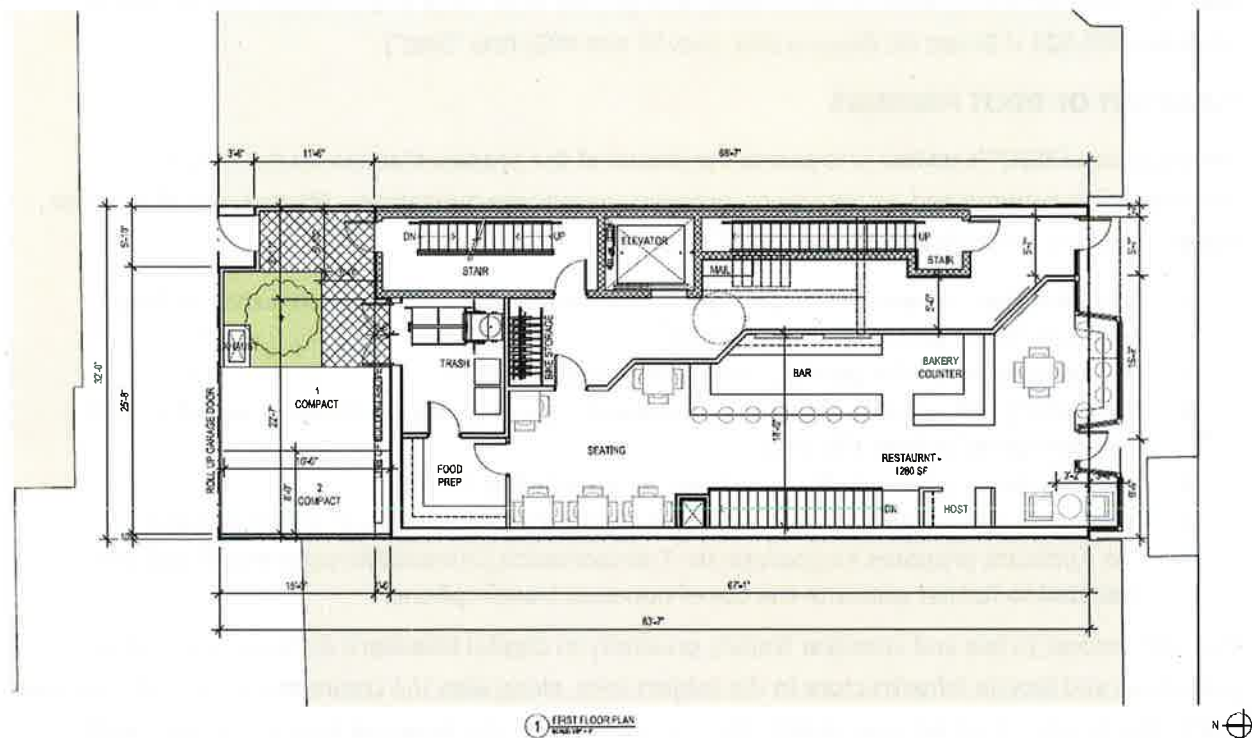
Proposed First Floor Site Plan (Source: Applicant)
